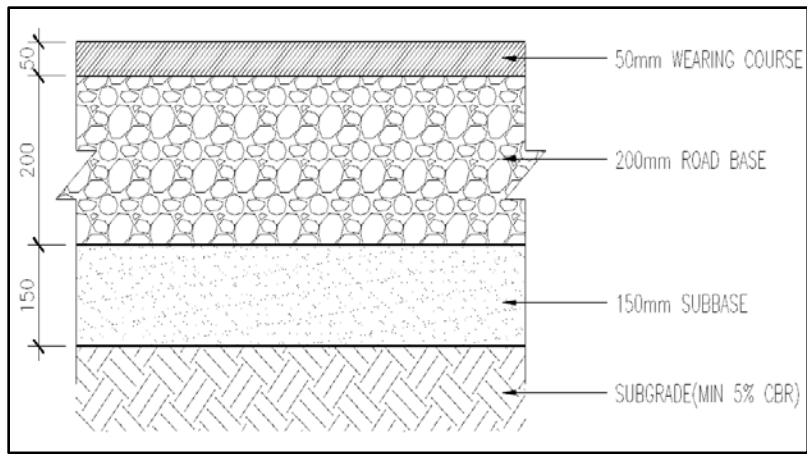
FLEXIBLE PAVEMENT STRUCTURE
